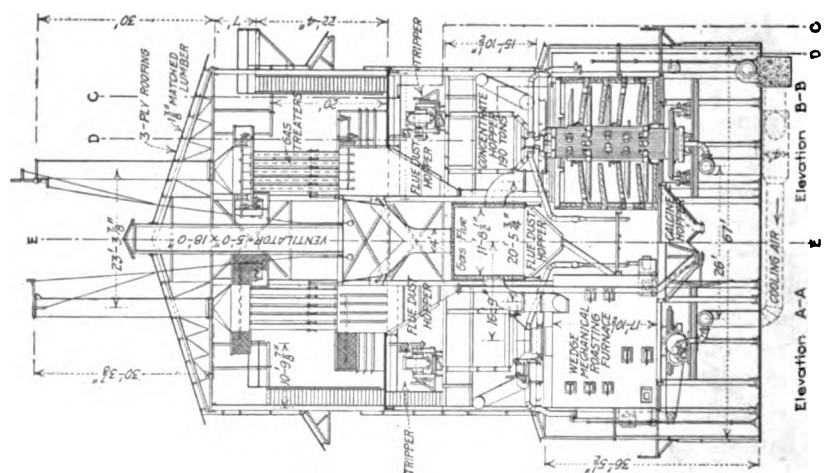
END ELEVATION OF ROASTER OR DRYER PLANT, INTERNATIONAL SMELTING CO.
